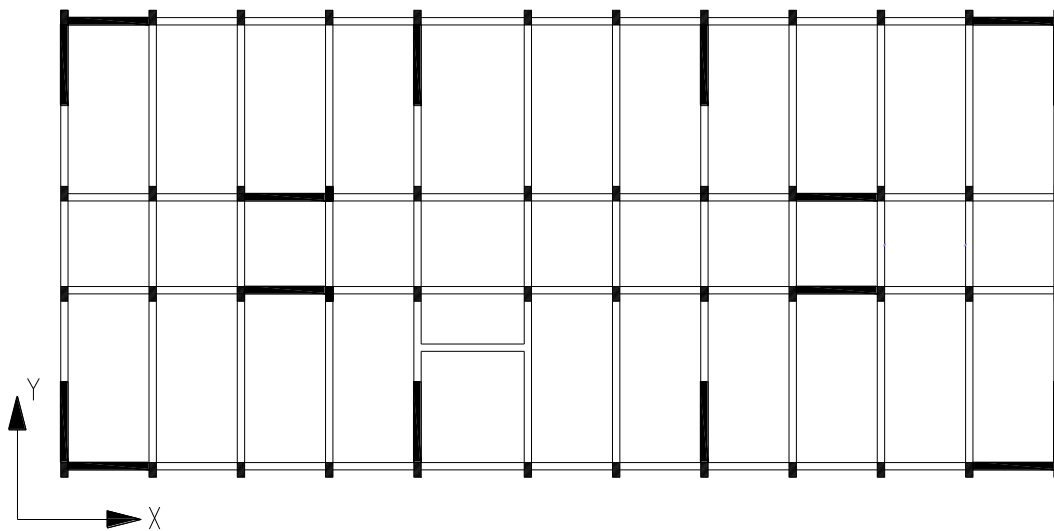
Plan View of the Designed Building with 1.0%-1.0% Shear Wall Ratio
